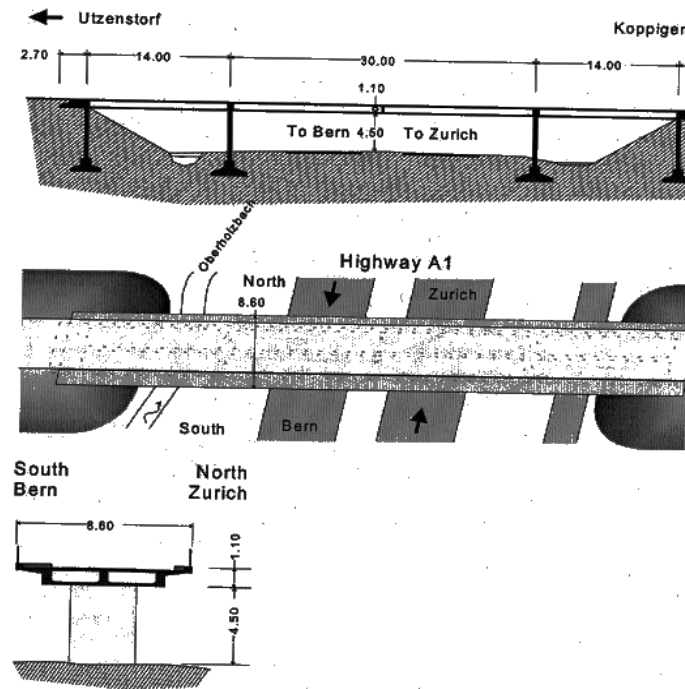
Top view, cross-section, elevation of Z24 (Roeck, 2000)
